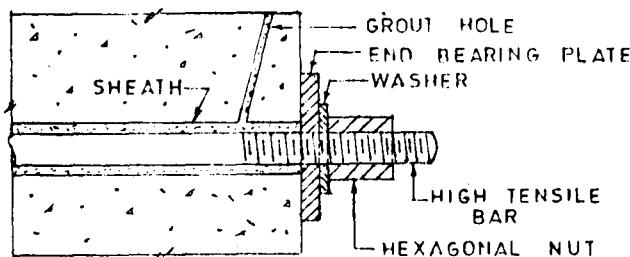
ANCHORAGE FOR GIFFORD-UDALL SYSTEM
